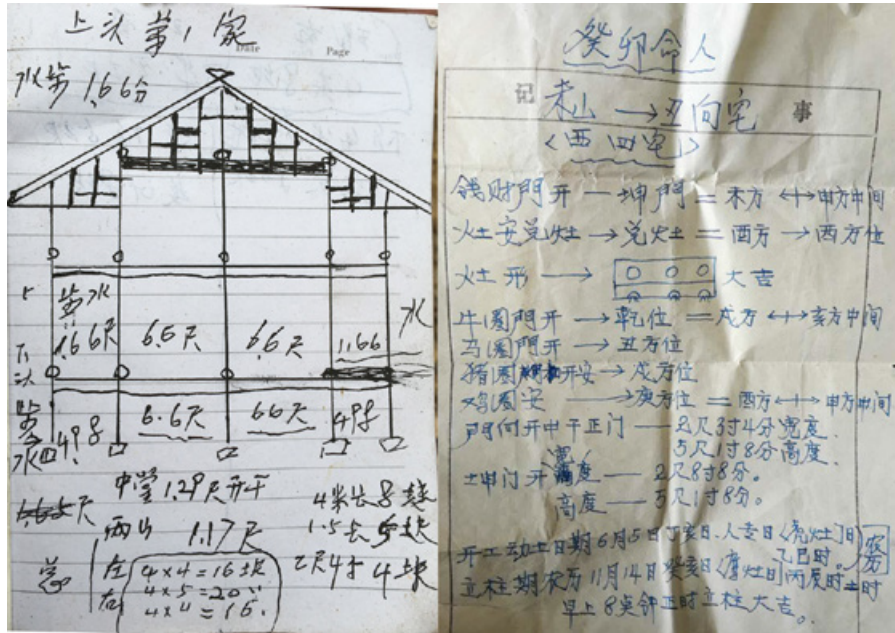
Local craftsmen made the hand drawings based on the Mojing. The drawing on the left demonstrates the dimension of building components. The drawing on the right shows the orientation and width of the dwelling and barn gates, the stove’s shape, and the groundbreaking date. Mojing continues to be a deeply rooted belief system that guides house construction throughout Banwan village. The photo was taken on September 25, 2016. (Source: Local craftsmen)
